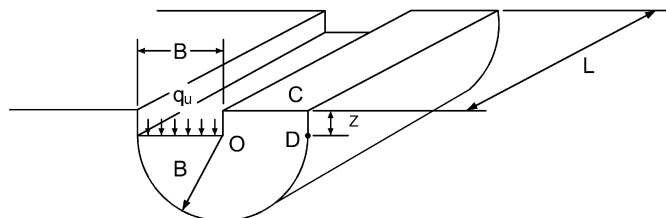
Foundation failure rotation about one edge.
